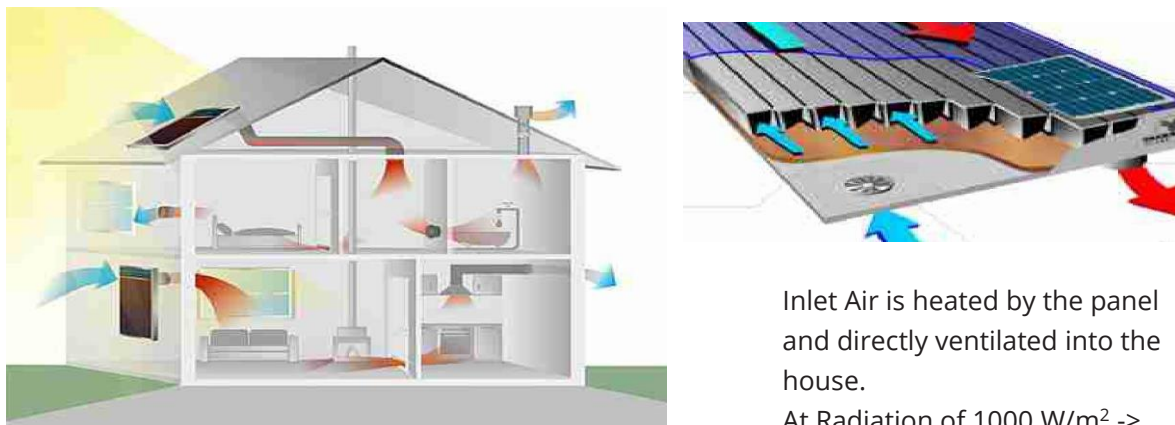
Working Principle of collecting warm air with PV-Modules using the back ventilation – Applicable on entire roof (Solarwall.com)
